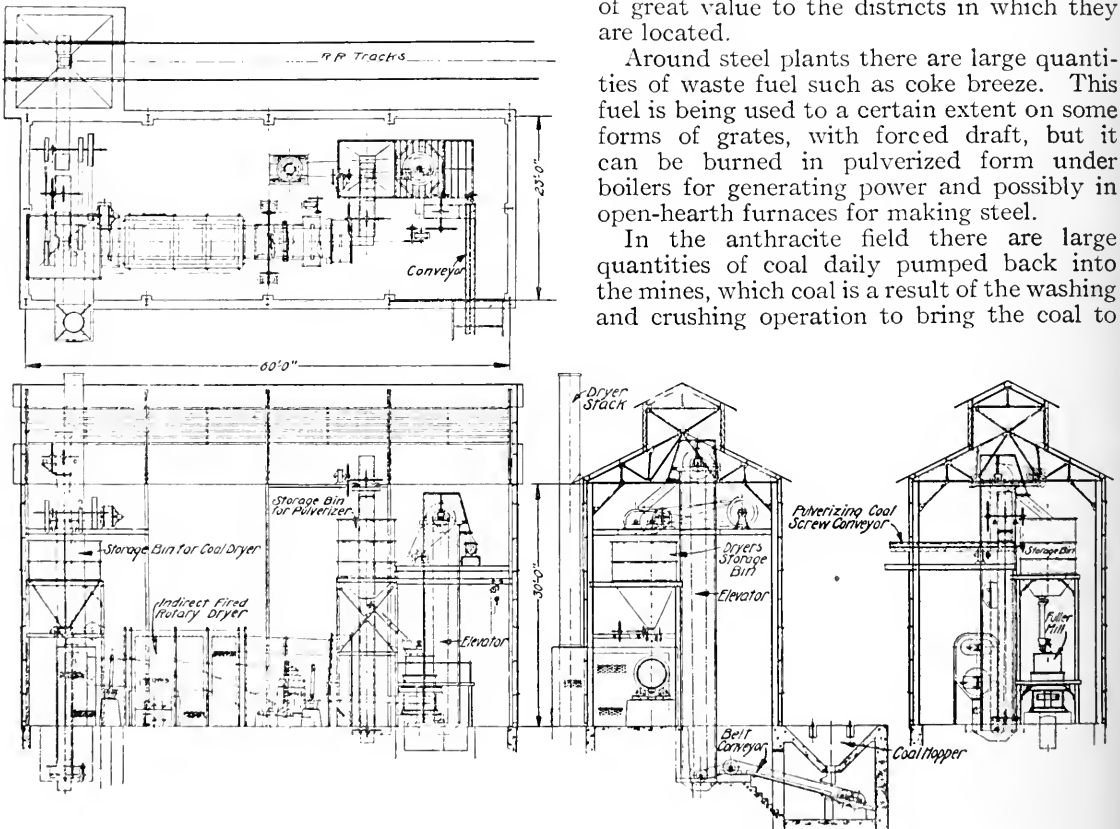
Plan and Elevation of Plant for Pulverizing Coal
